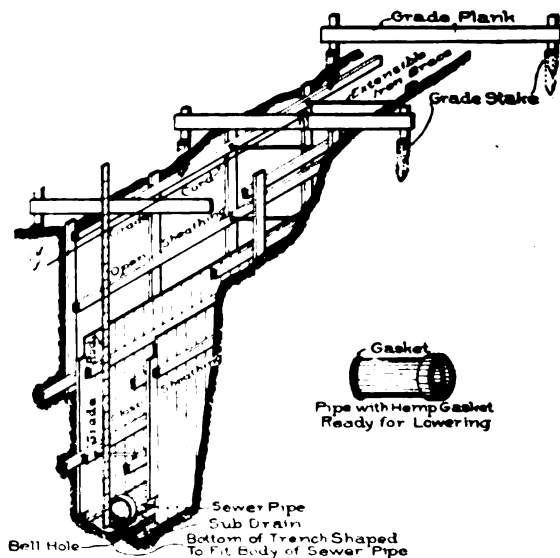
Diagram Showing Construction of Pipe Sewer.
